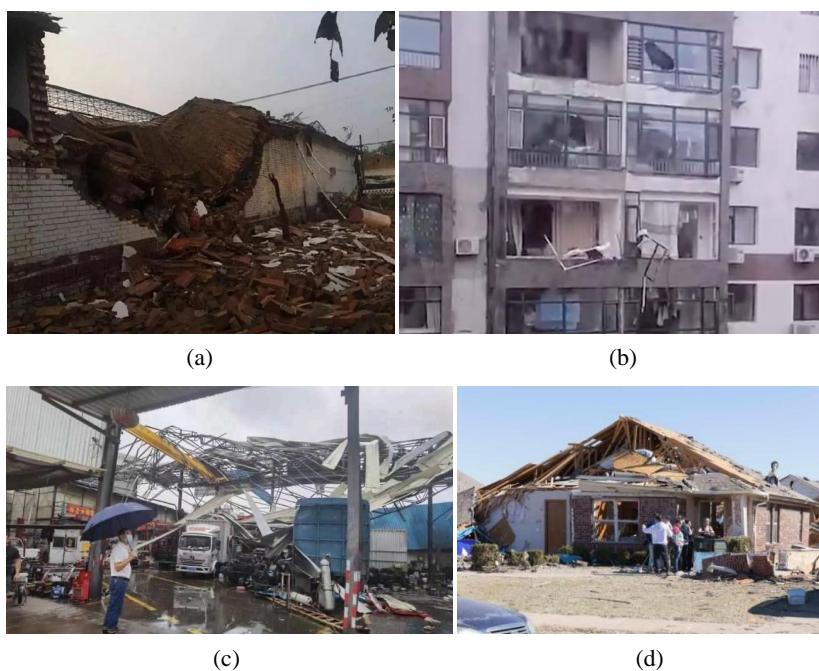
Examples of damaged buildings of different structure types after tornadoes: (a) Damage of brick-concrete house (2018.8.13, Jinghai, Tianjin); (b) Damage of reinforced concrete building (2021.8.25, Huludao, Liaoning); (c) Damage of steel structure facilities (2022.7.4, Huangpu, Guangdong); (d) Damage of wooden house (2023.2.26, Oklahoma, USA)
